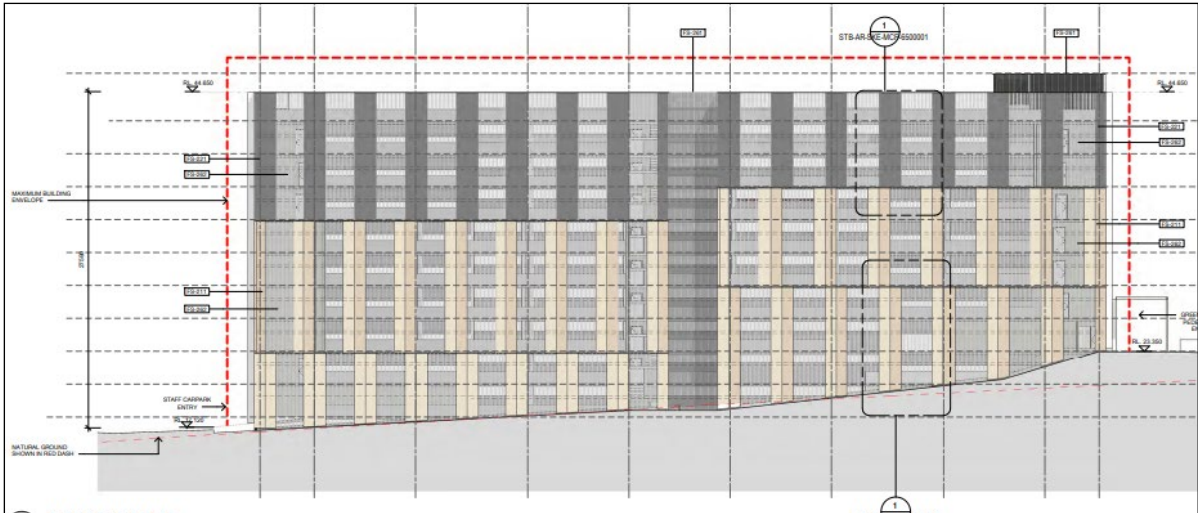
| Proposed material changes to façade for the southern elevation of the multi-deck carpark (Source: SSD-10353-Mod-3 Architectural Plans)
